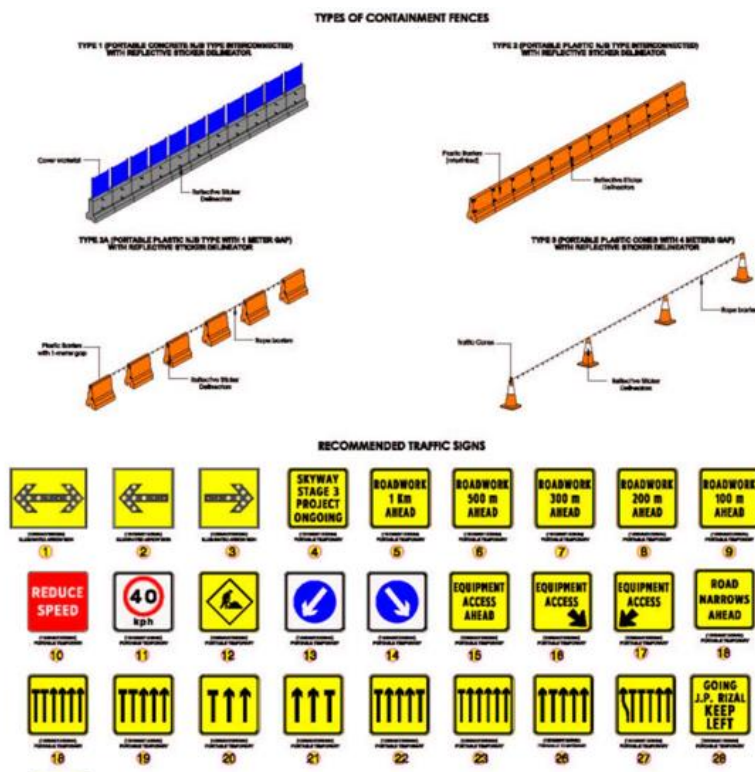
Recommended Traffic Signages for TR4 Construction
